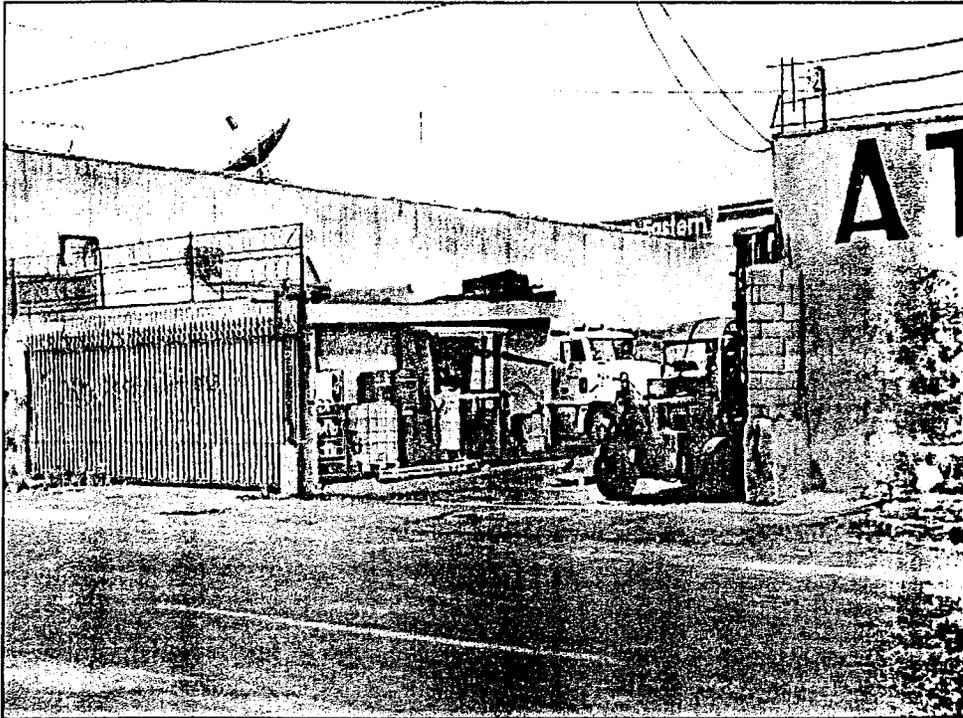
No sidewalks, curbs or gutters at 4207 Whiteside St.
